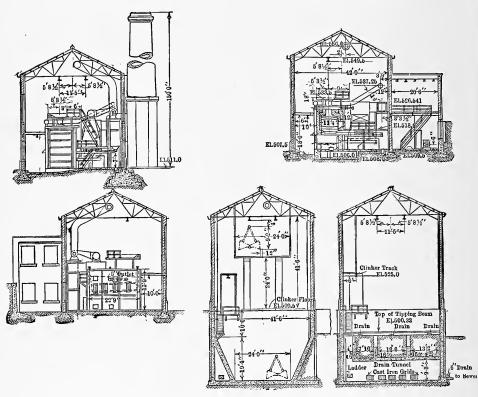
General Sectional Arrangement of Atlanta Incinerator.
